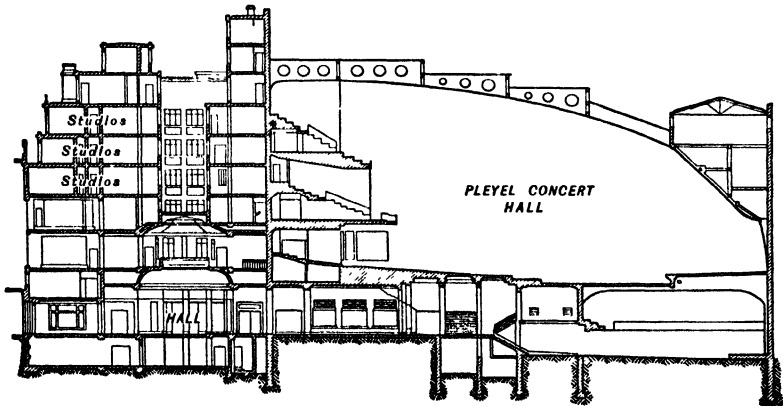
Longitudinal section of Salle Pleyel, showing the approximately parabolic ceiling.
